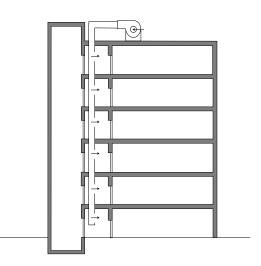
Elevator Smoke Control Using Shaft Protection
